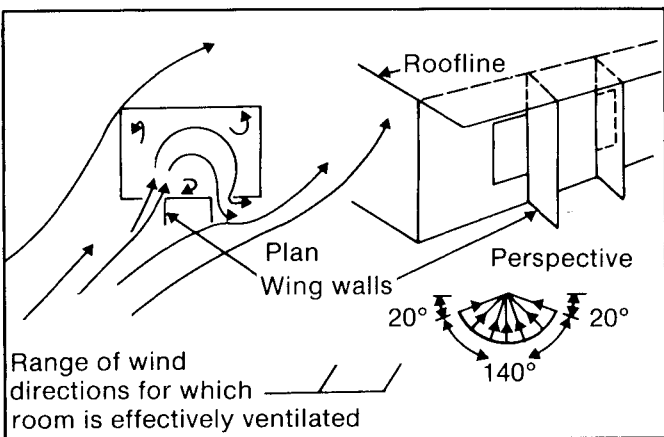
Good Ventilation Through Windows on One Wall When Wing Walls are Added
